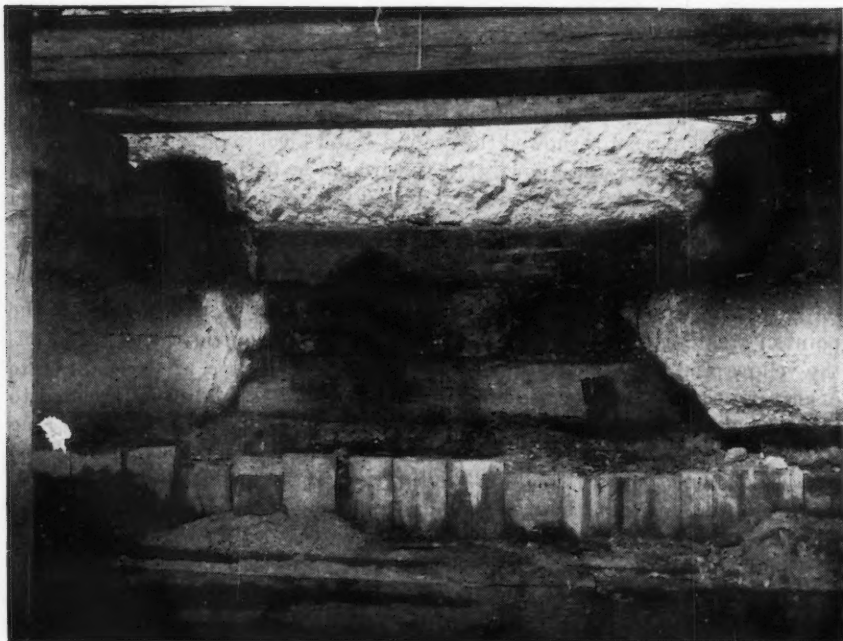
EDGE OF A TIMBER CRIB UNDER THE BROOKLYN ANCHORAGE
